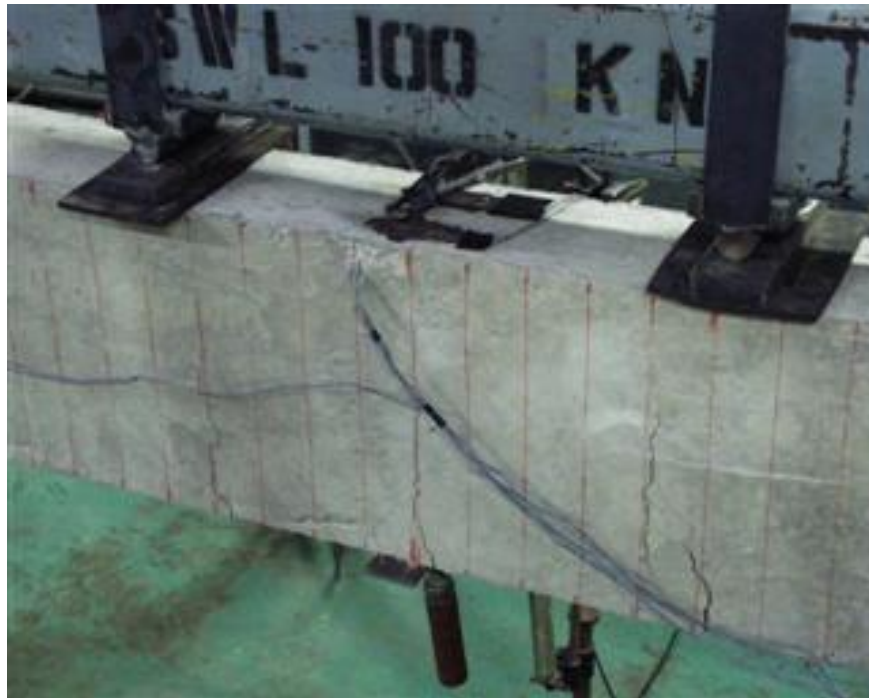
Typical Flexural Crackign Pattern for All Test Specimens
